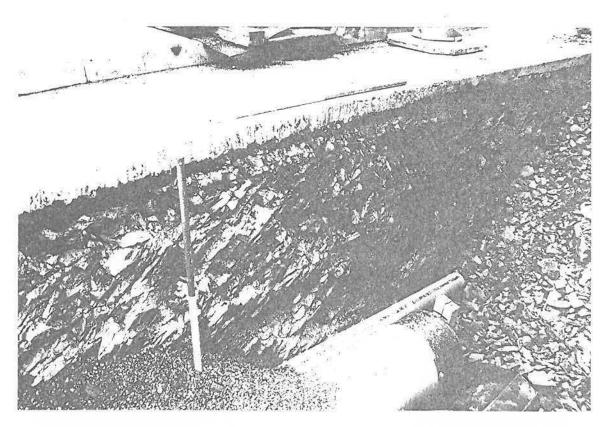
Bedrock Outcrop At West End Of Recorded Trench (south facing)
